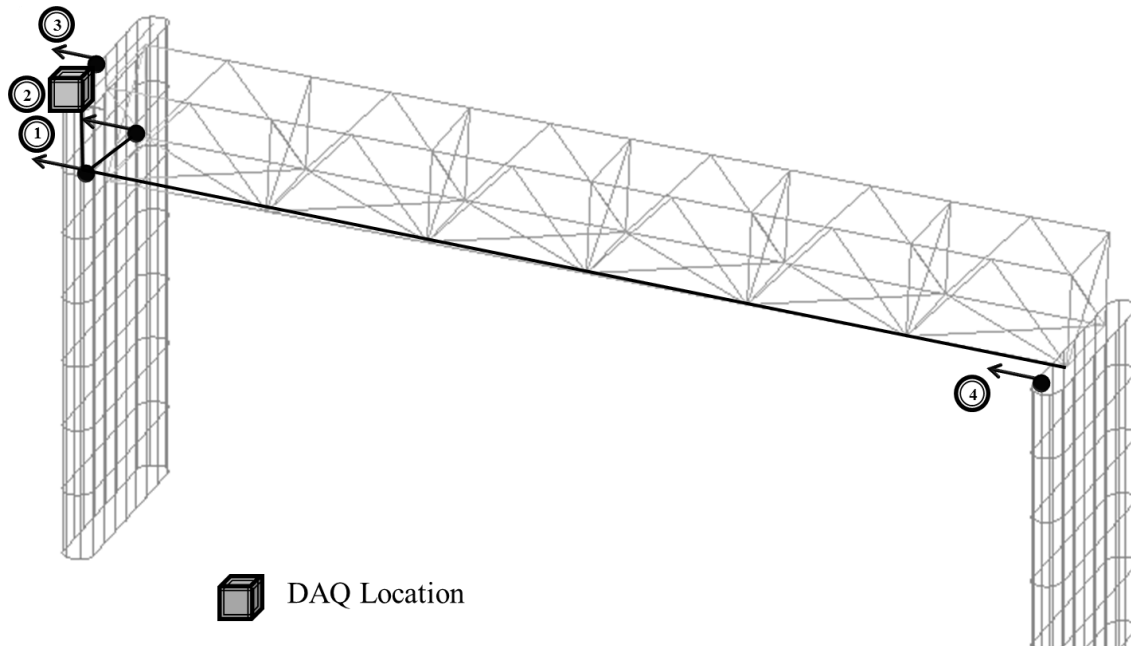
NJ Truss Span Longitudinal Instrumentation Plan
